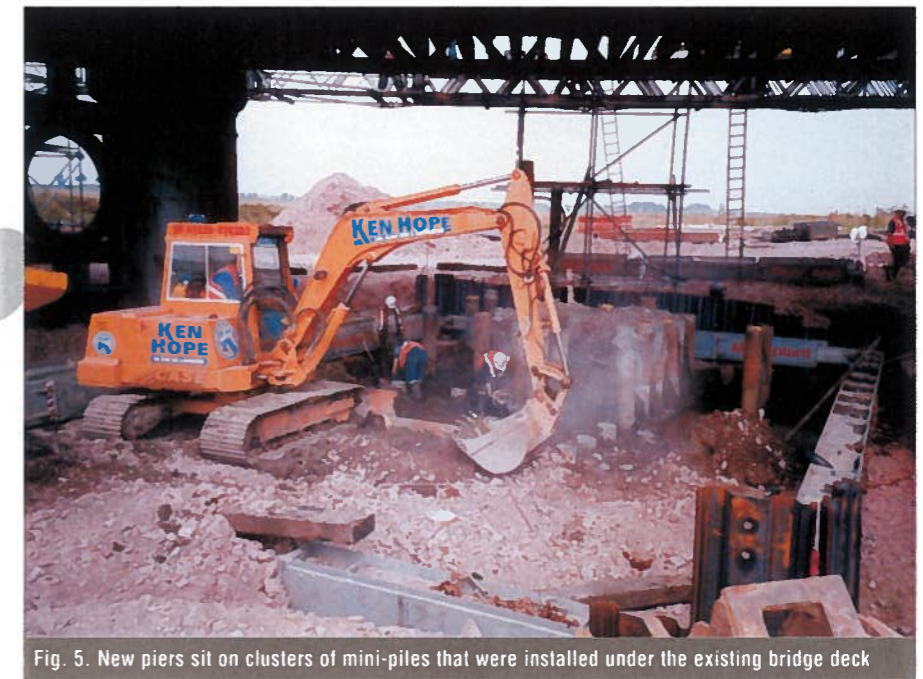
New piers sit on clusters of mini-piles that were installed under the existing bridge deck
